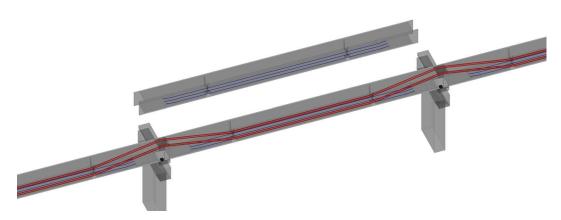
Longitudinal girders in the precast plant (rear) and installed (front)
